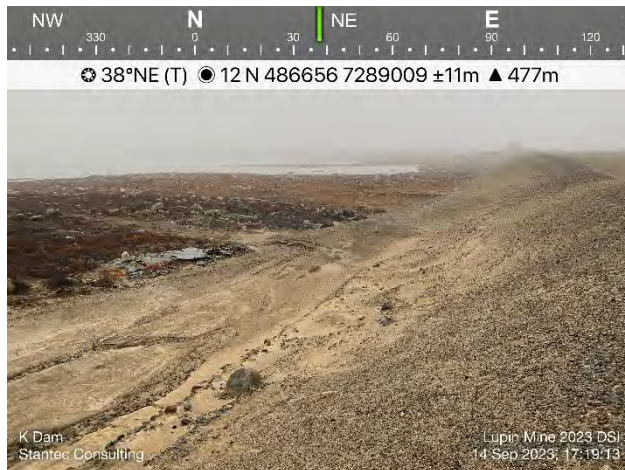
The downstream embankment and toe area at K Dam as viewed from near its left (SW) abutment.
